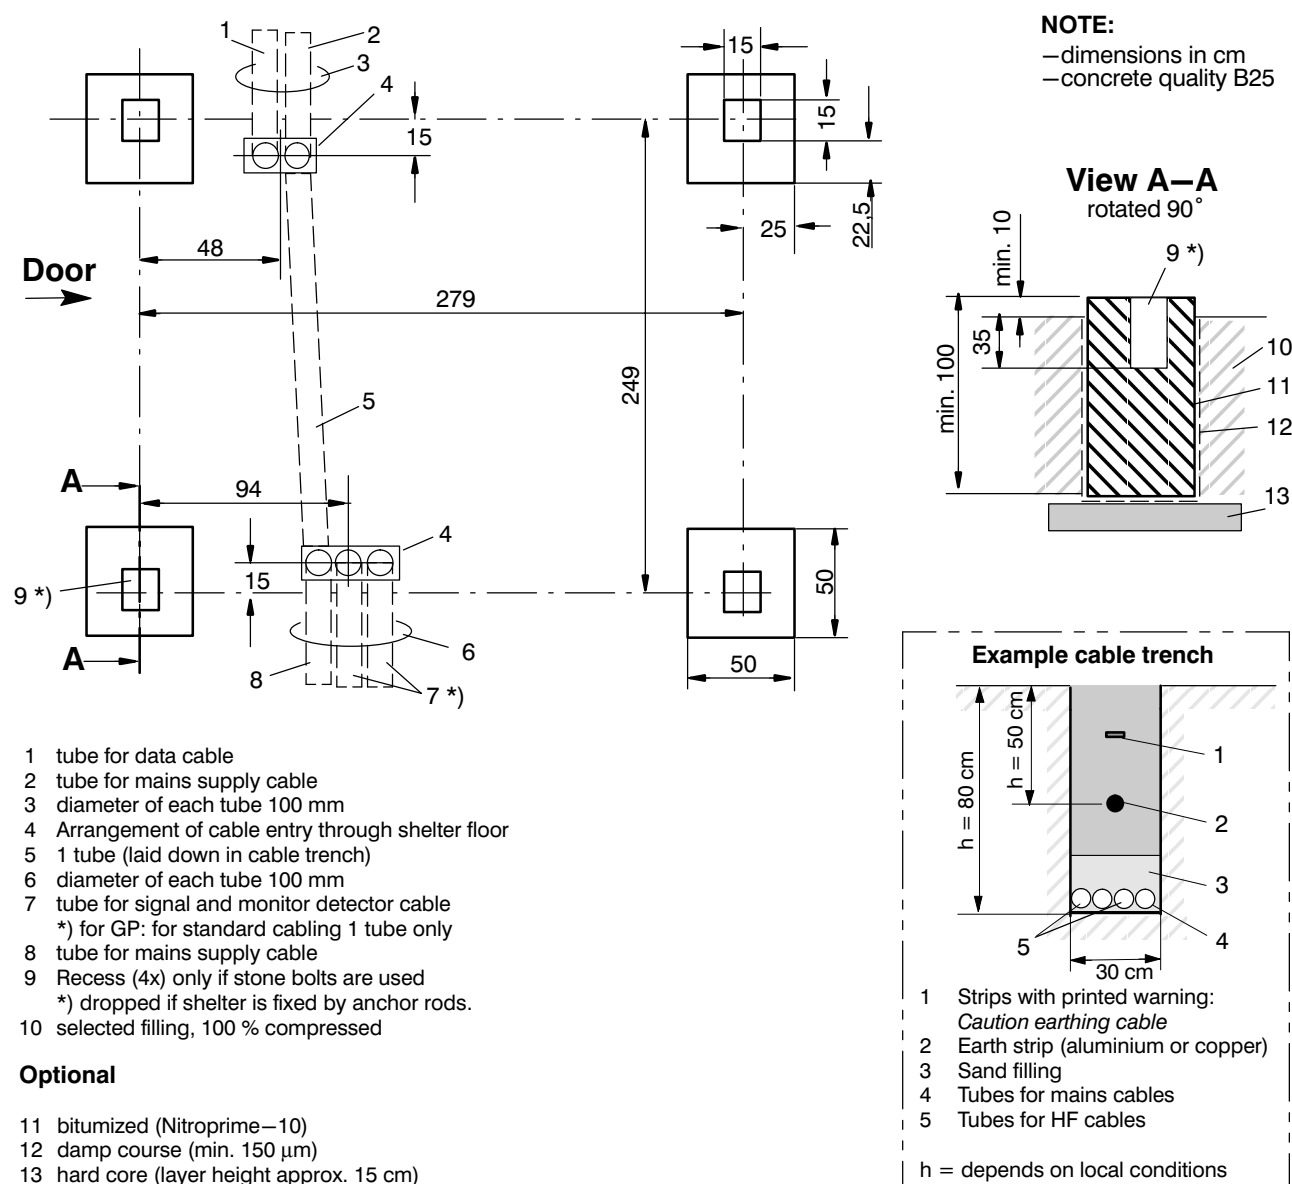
Standard foundation for Shelter (10 ft) and cable trench example
